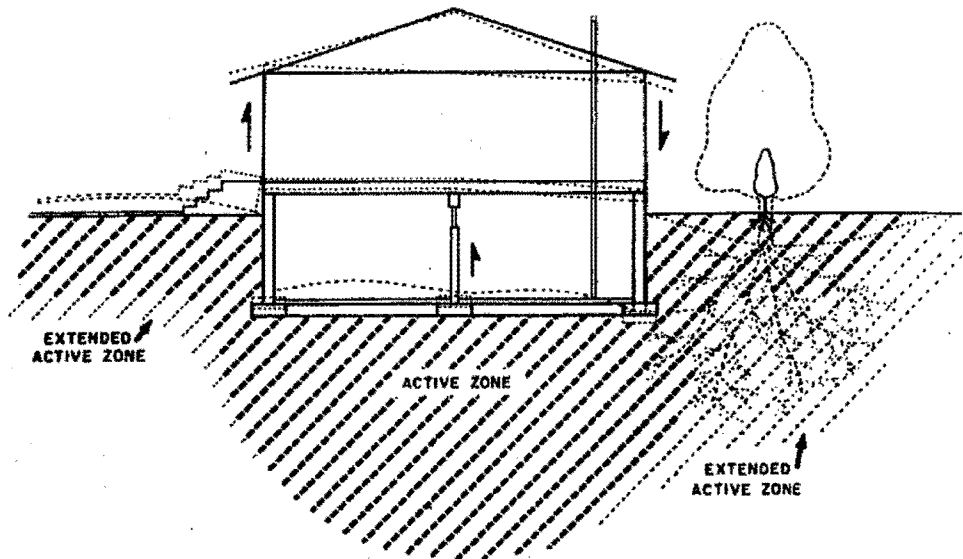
Shallow Foundation System and Grade Supported Basement Floor Slab
